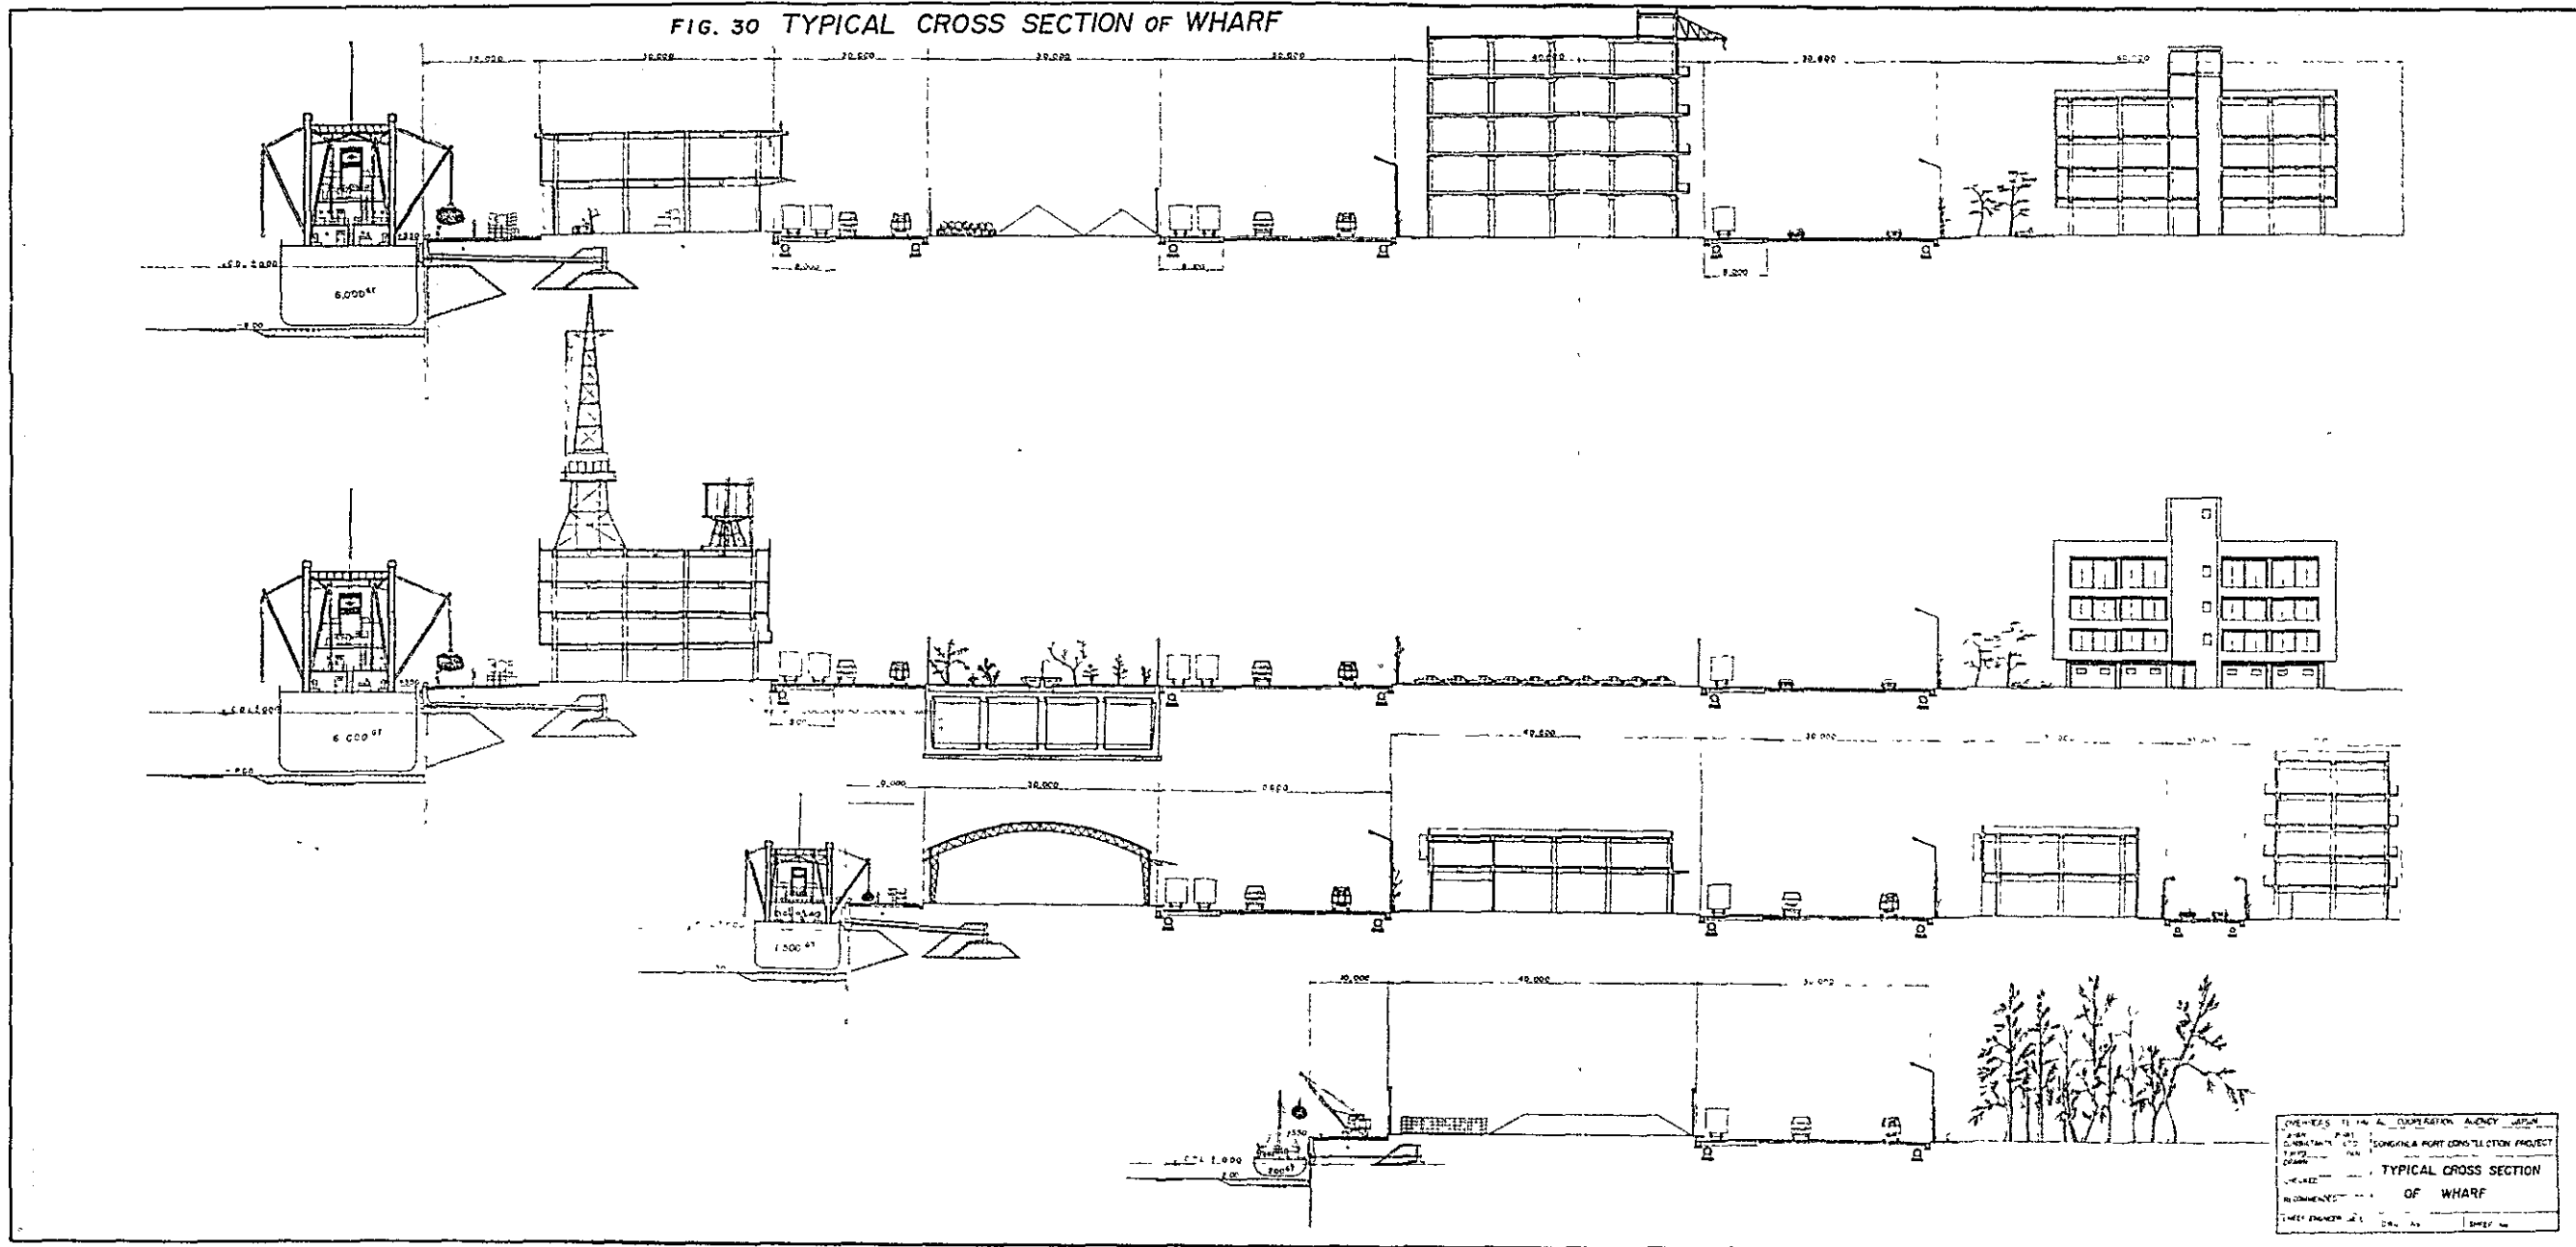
TYPICAL CROSS SECTION OF WHARF
